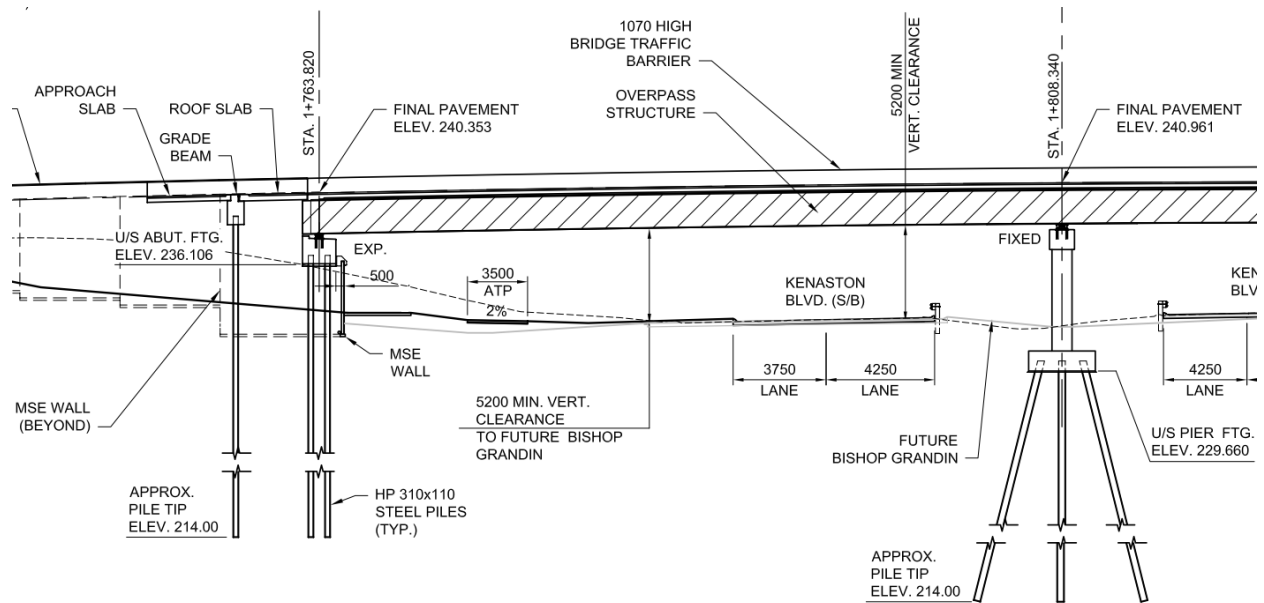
STRUCTURAL ARRANGMENT (WEST SPAN)
